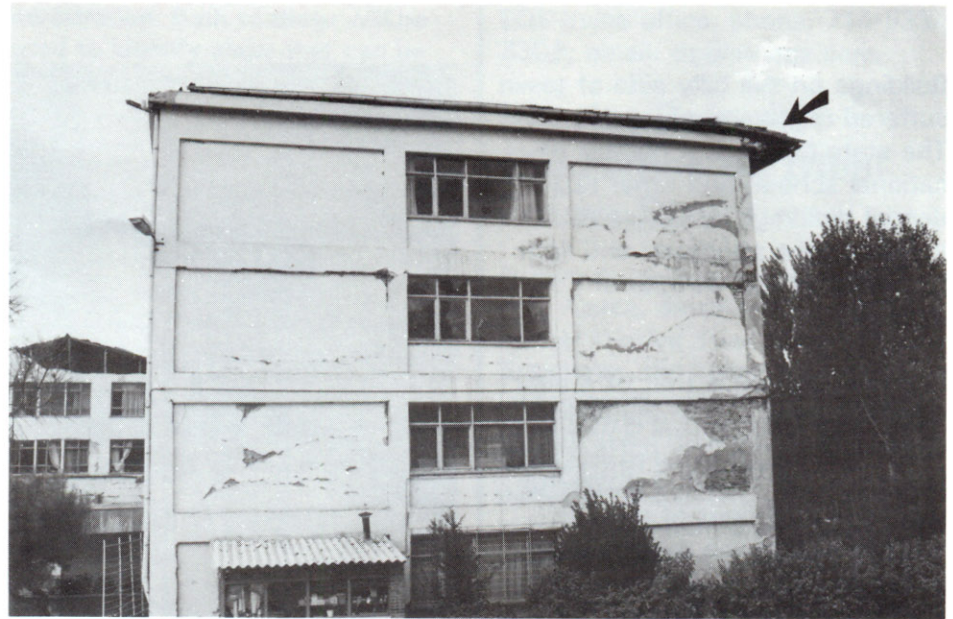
Many roofs were damaged - this one moved about 1 meter N-E.
